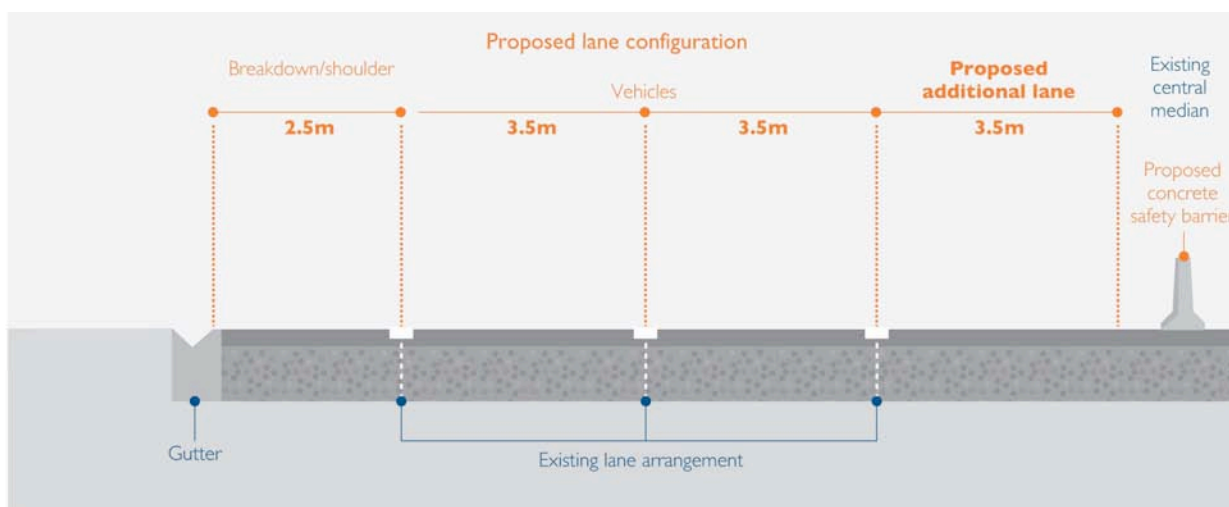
Indicative cross-section of the widened carriageway showing the effect altered lane marking
